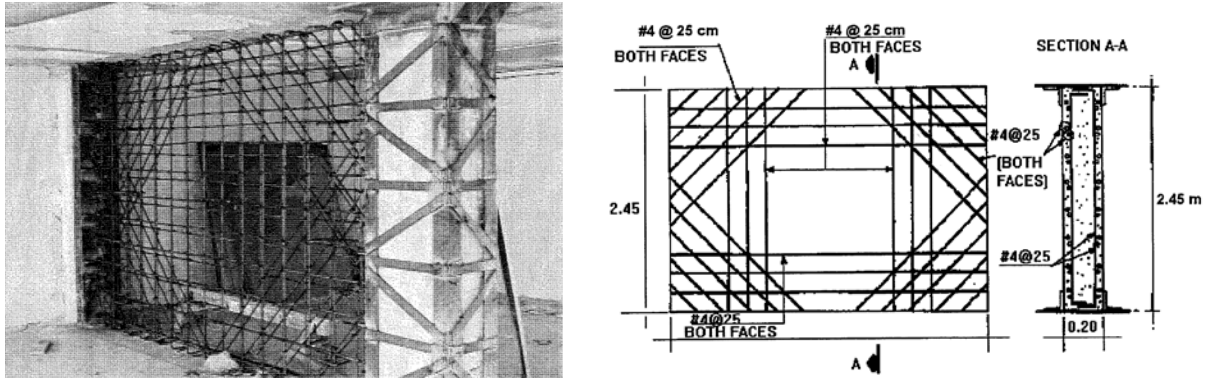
Wall reinforcement and column jacketing in Z251 (left), details of the retrofit (right) (Aguilar et al., 1996)
